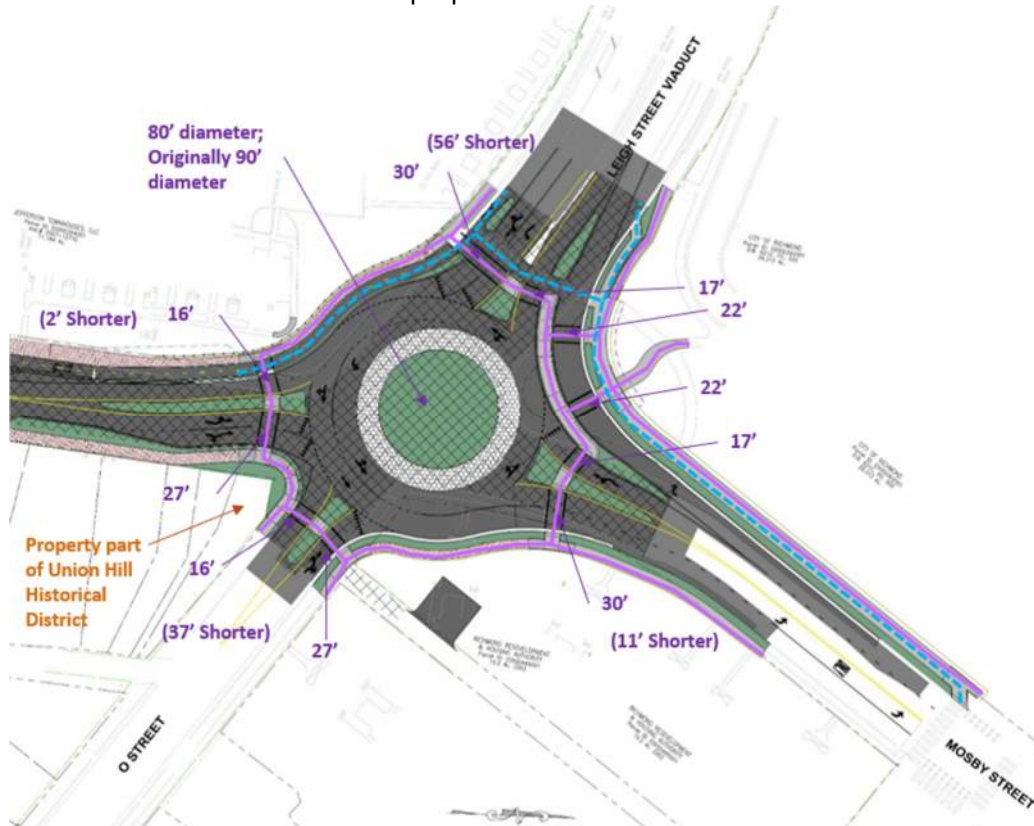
60% Mosby Street and Leigh Street Viaduct Roundabout
